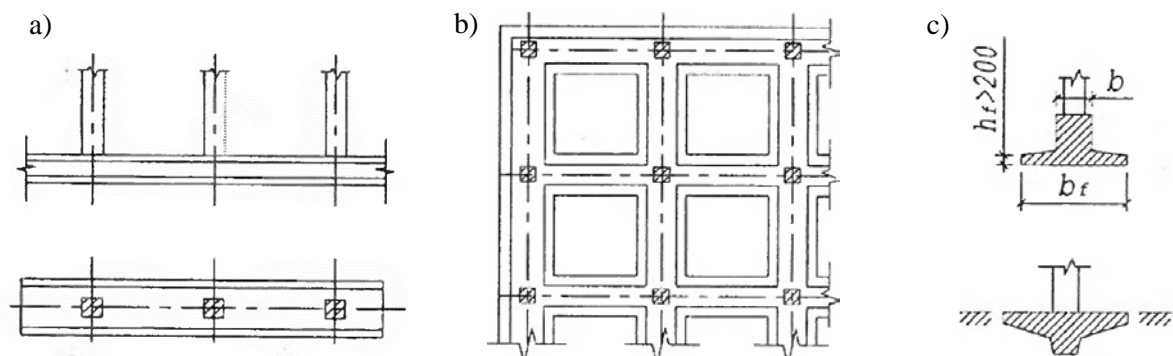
Example of reinforcement ( a –strip foundation, b- cross-strip foundation, c – cross-section of strip foundation)
